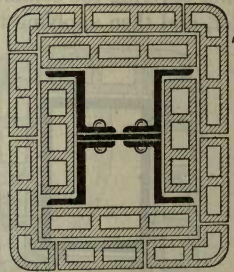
Column Protection, "The Fair" Building, Chicago. Jenney & Mundie, Architects.
